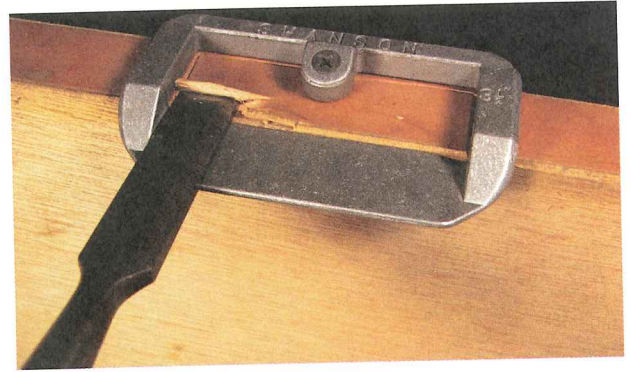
Butt hinge markers make mortising the hinge into a door easier.
